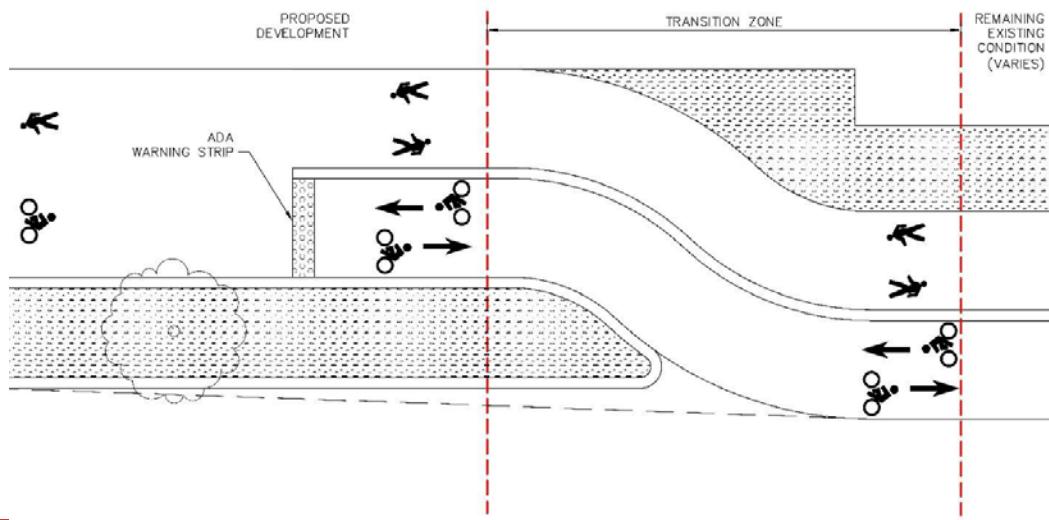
Off-Street/Raised to On-Street One-Way Bicycle Transition
